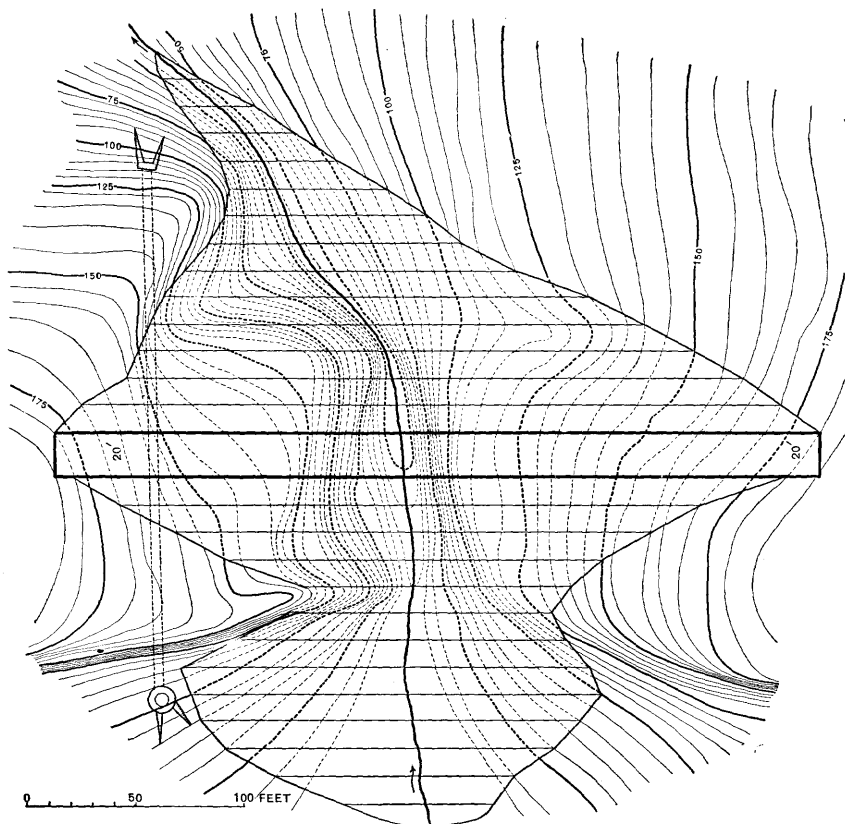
Plan of rock-filled dam, Briscoe dam site.
